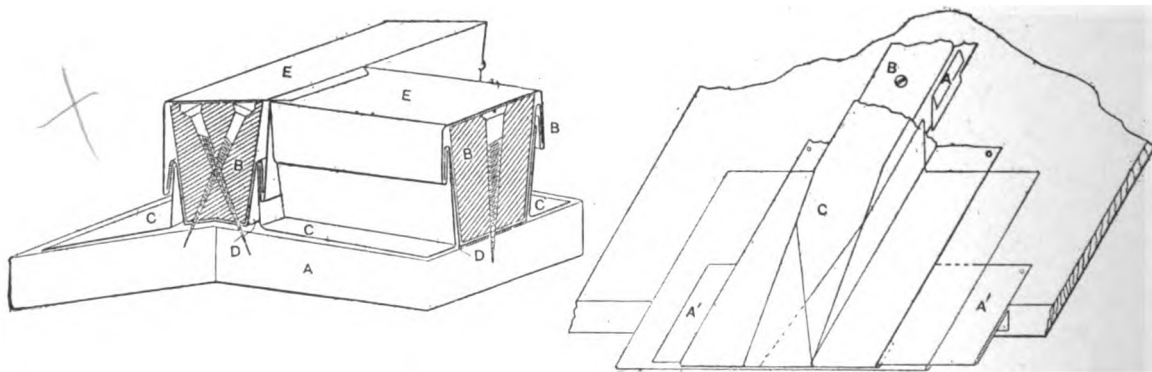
Showing Ridge Strip and Common Strip Fig. 171. Showing General Construction of Zinc Roof
